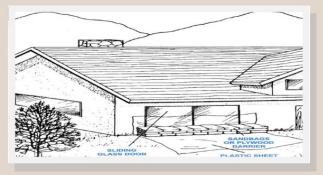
SLIDING GLASSDOORSEALING Control of flows to prevent seeping around sliding glass doors.
